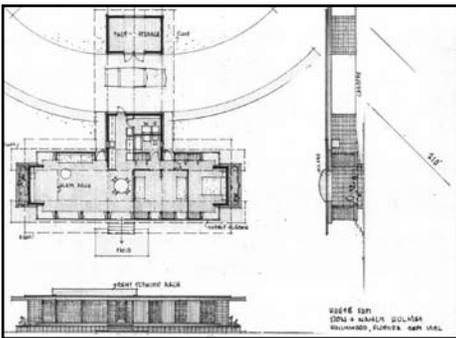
Floor plan of Hulmes House (built 1956) illustrating diagonal orientation of house to its site [Charles Reed, Jr. collection]
